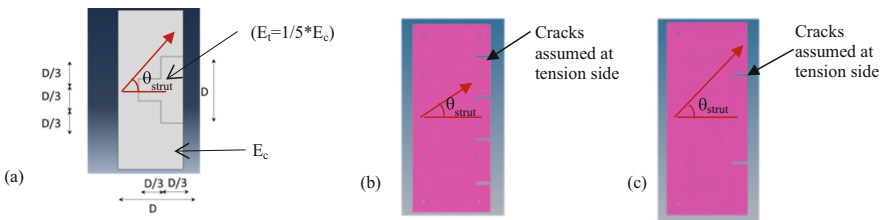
Model for (a) URM specimen with different elastic modulus in compression and tension side (b) ladder reinforced specimen with cracks in the tension side of masonry (c) diagonal brace reinforced specimen with cracks in the tension side of masonry
